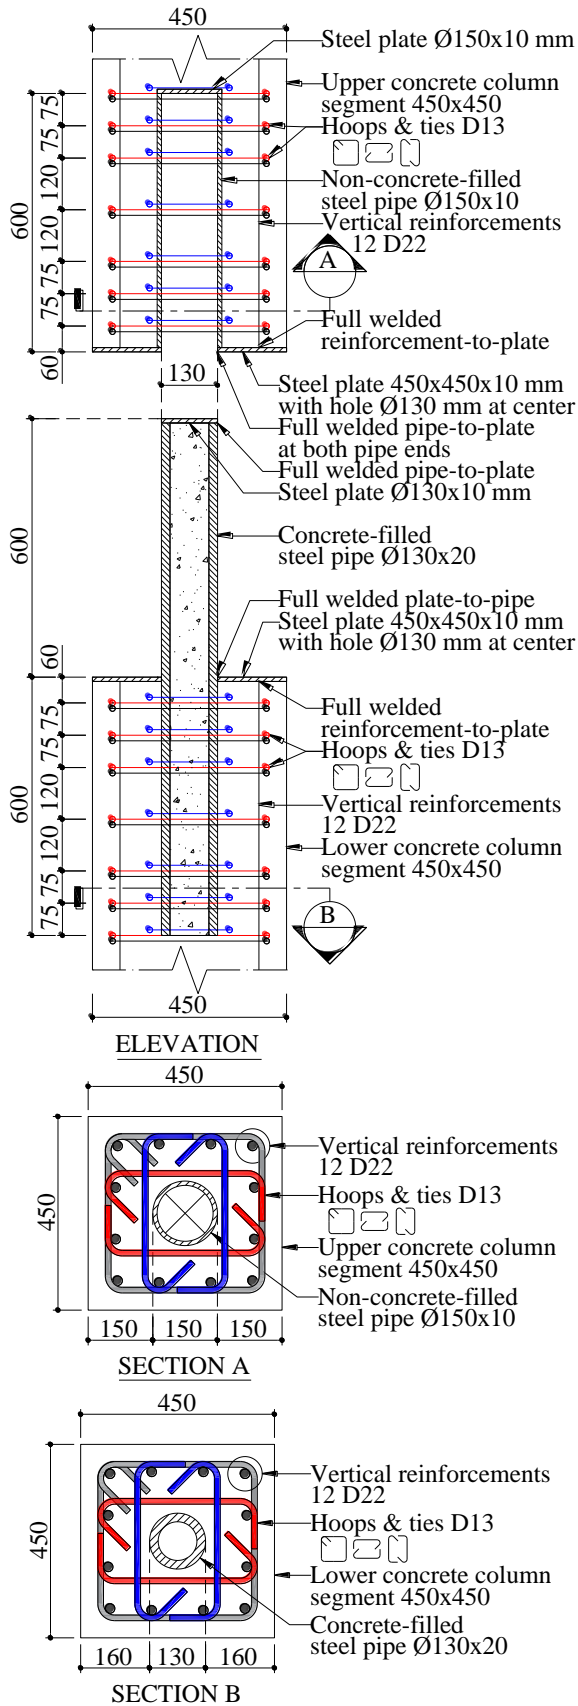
Example detail of precast concrete column mortise-tenon splice [24]
